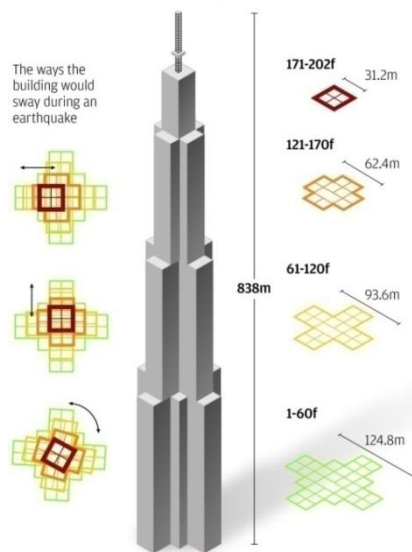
Sky City's floor plan and sway movements (adapted from [177])
